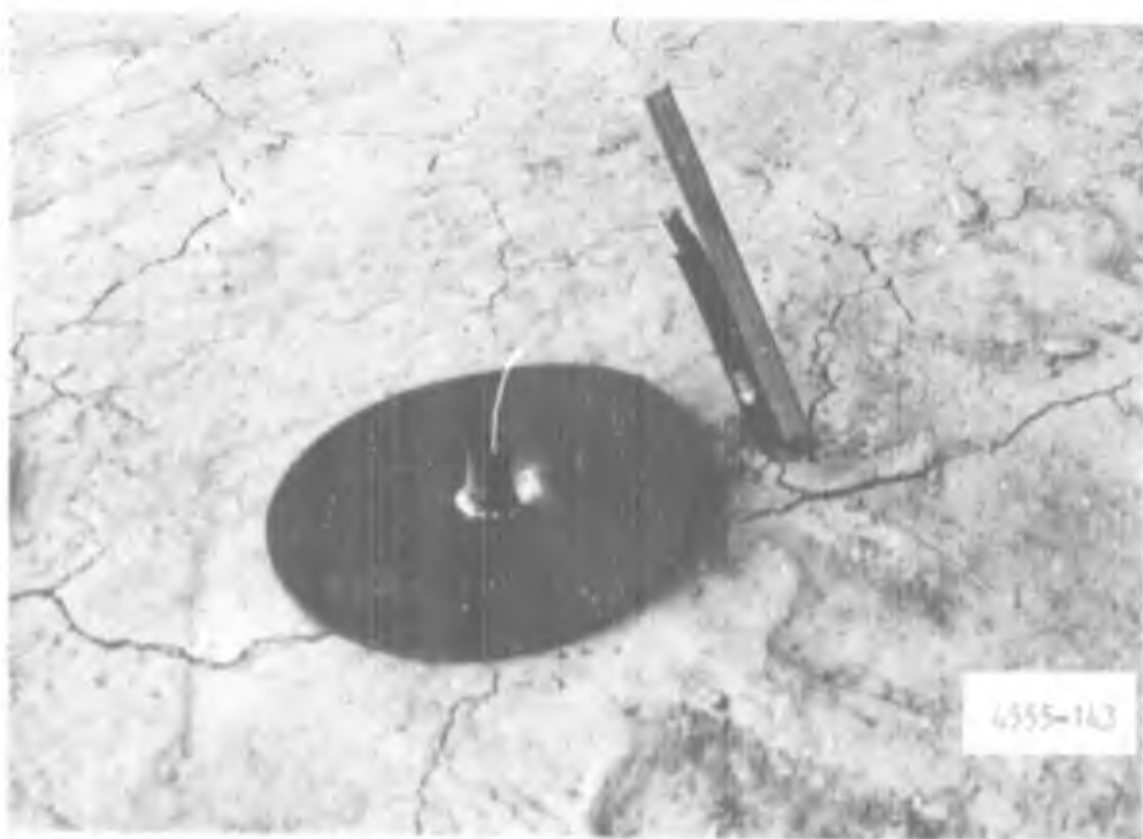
Anchor with straightened legs driven through membrane into the soil subgrade to a depth of 9 in.
